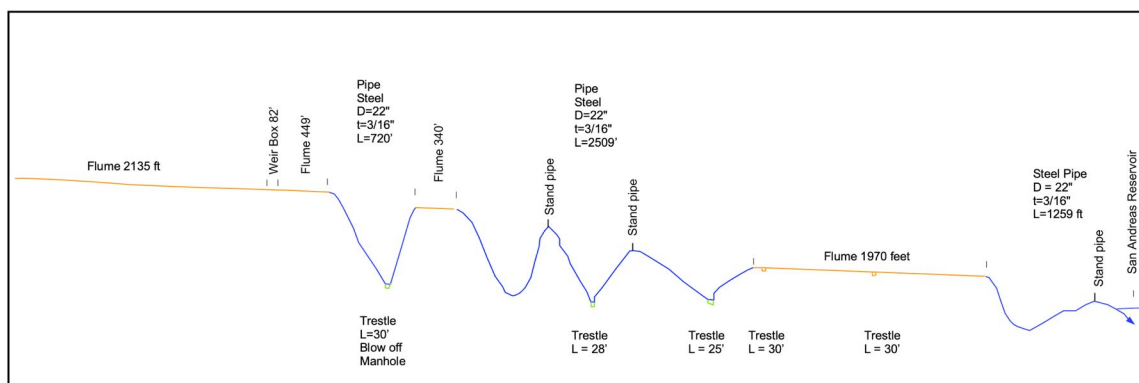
Pilarcitos Waste Water Conduit to San Andreas Reservoir (1905)
